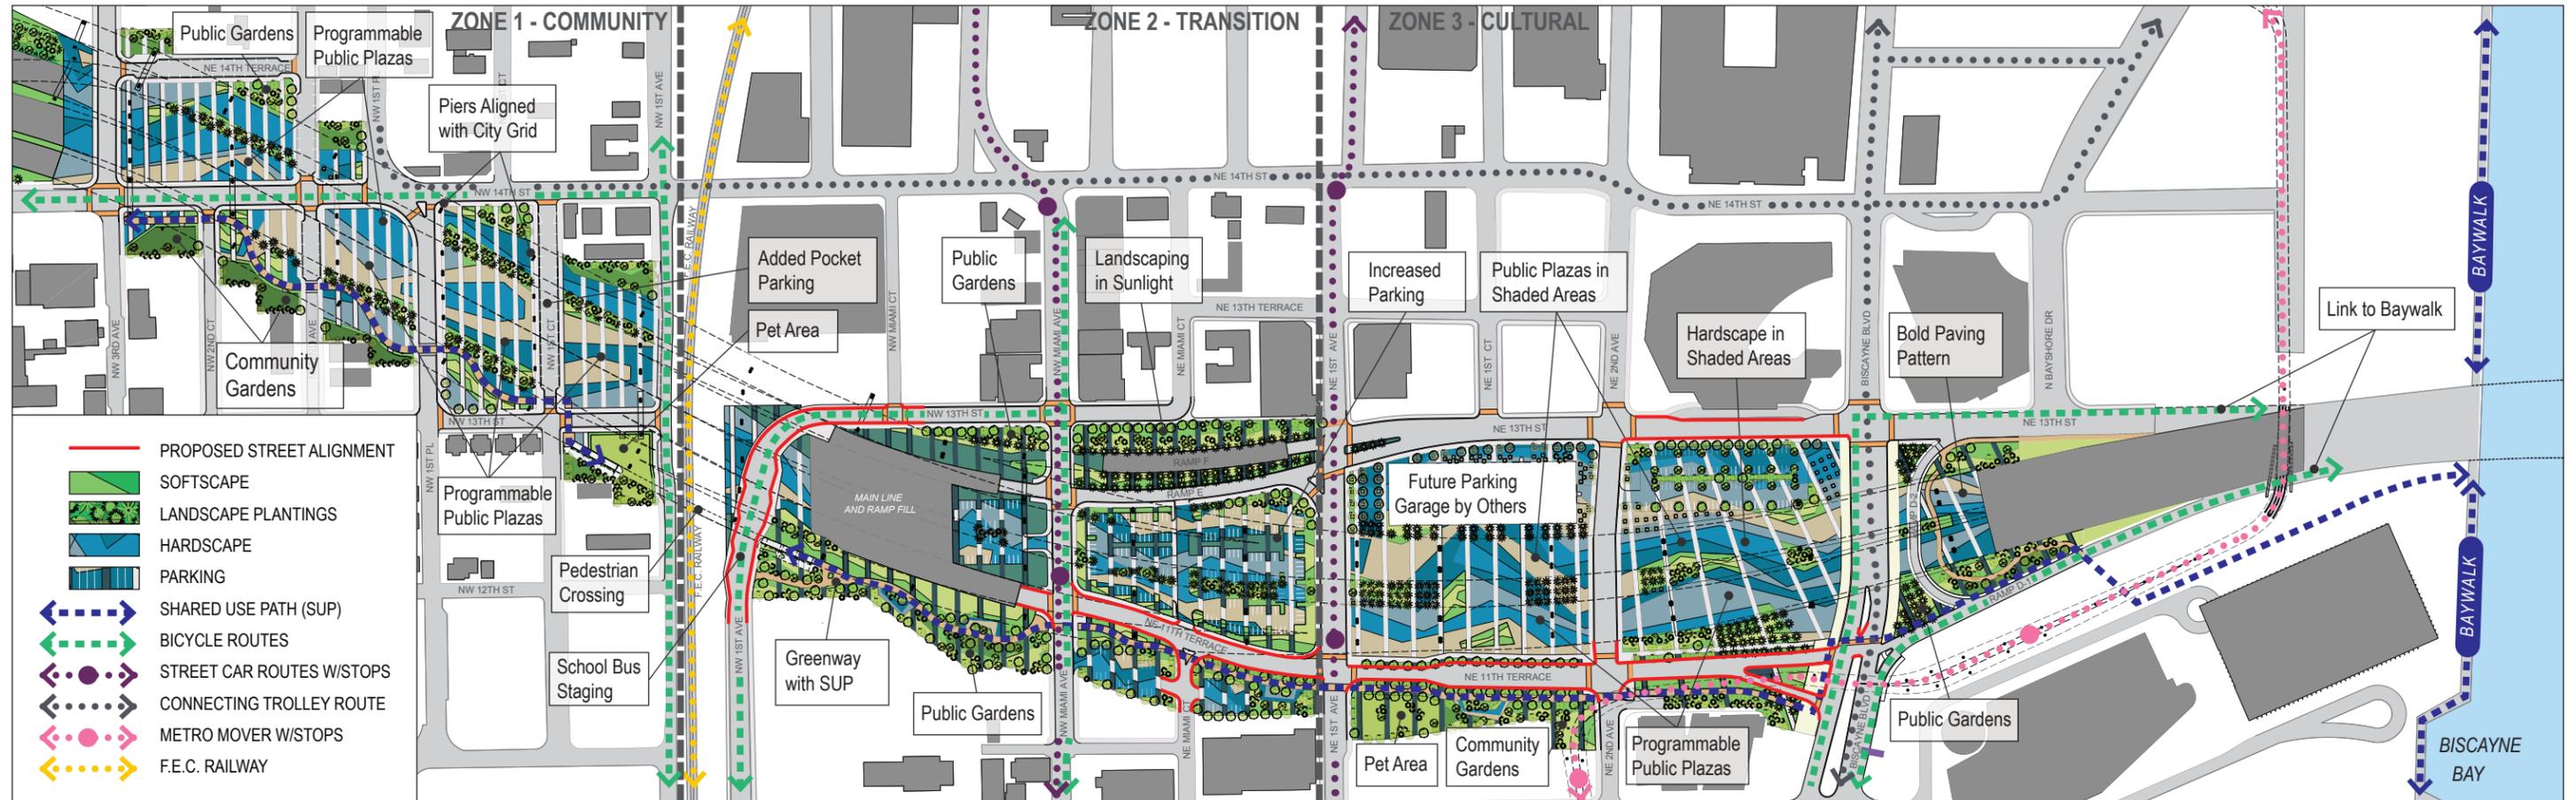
Corridor Site Plan for Zones 1, 2, and 3
